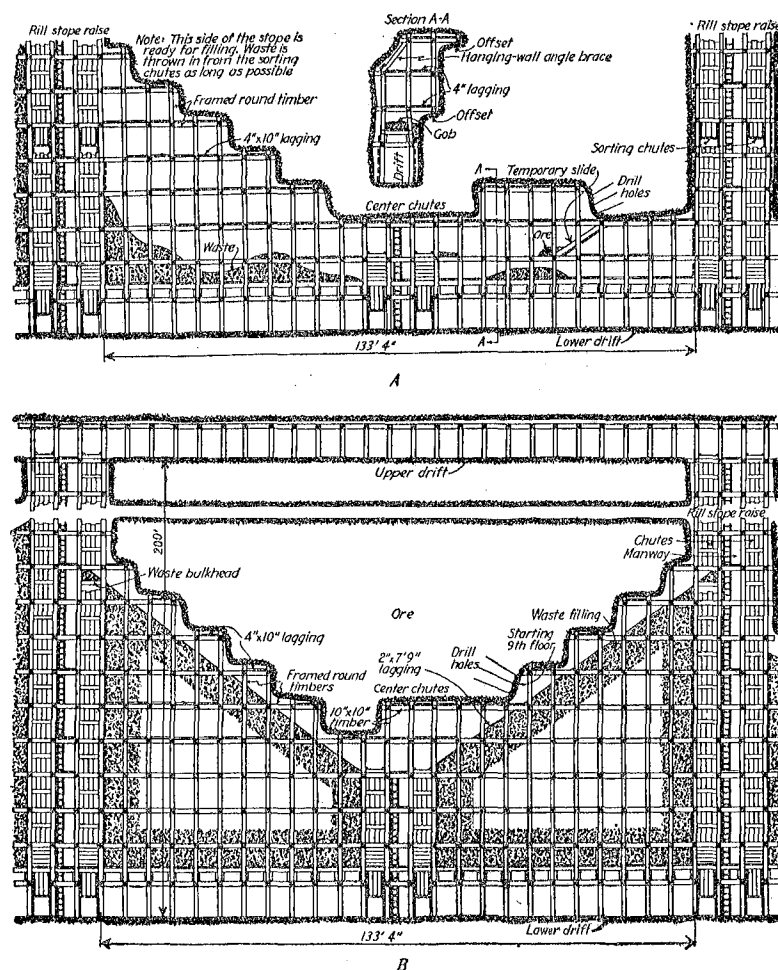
Timbered rill stope, Butte: A, Early stage of stoping; B, stope completely developed.
